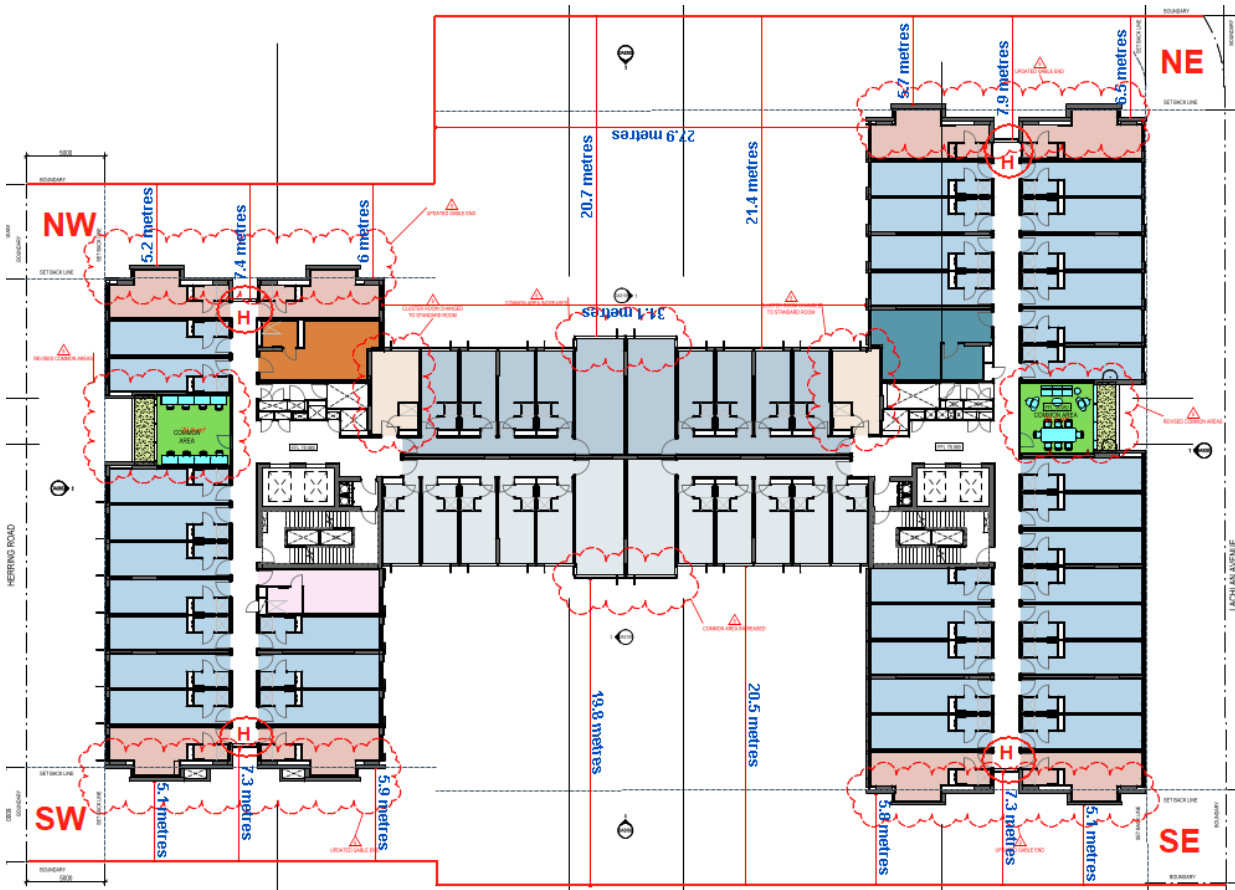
Typical building separations at Levels 1 to 9 (side boundaries are marked in red).
